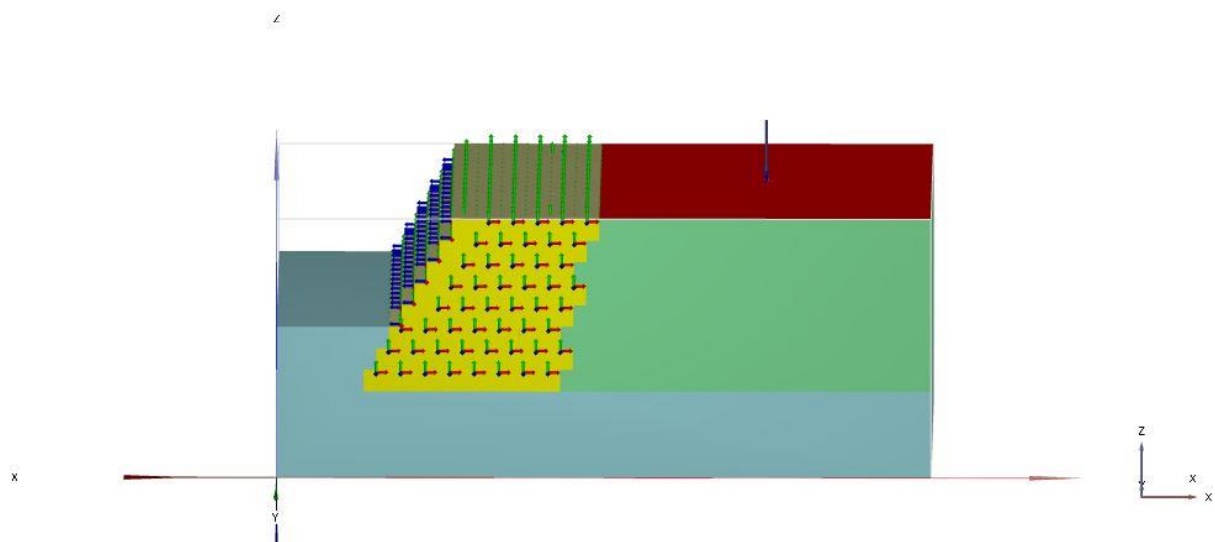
Geocell reinforced retaining wall model inclined with facing angle making 60° with horizontal with surface load generated in PLAXIS 3D
